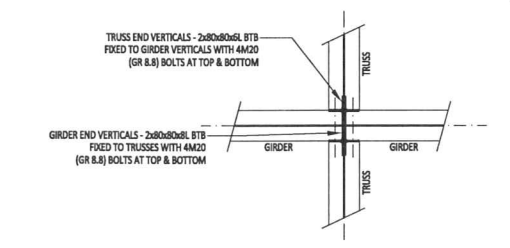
TYPICAL TRUSS TO COLUMN CONNECTION
